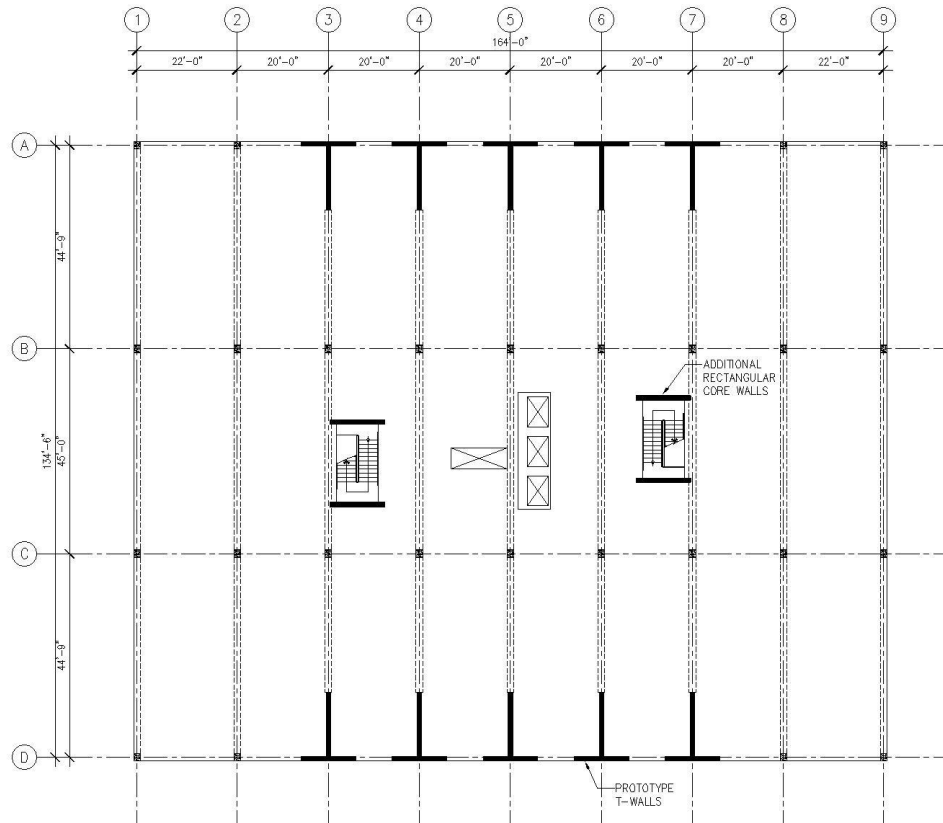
Floor Plan of the Six-Story Prototype Building
